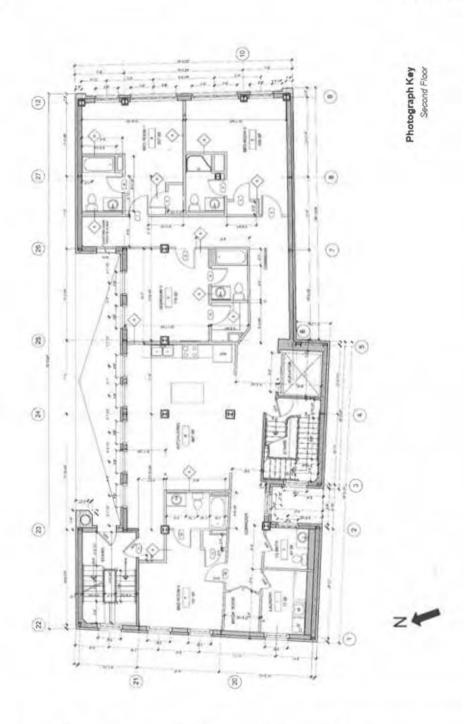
Second-floor plan (2016). Reproduced by permission from the current owner, Wallachia LLC.
